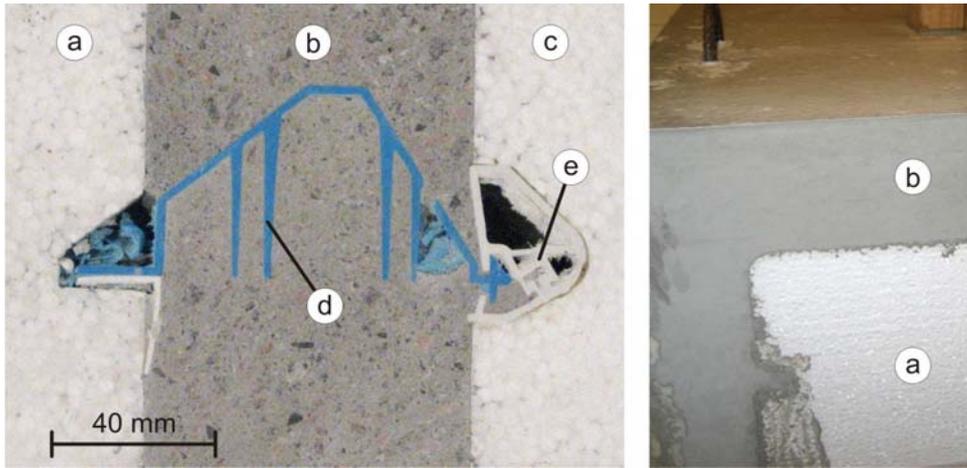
Cut cross section of a cast foundation beam using mix Lab 1 (left) and surface cast against an acrylic glass pane (right): a) inner core; b) concrete; c) outer mold; d) fastener; e) plastic profile
